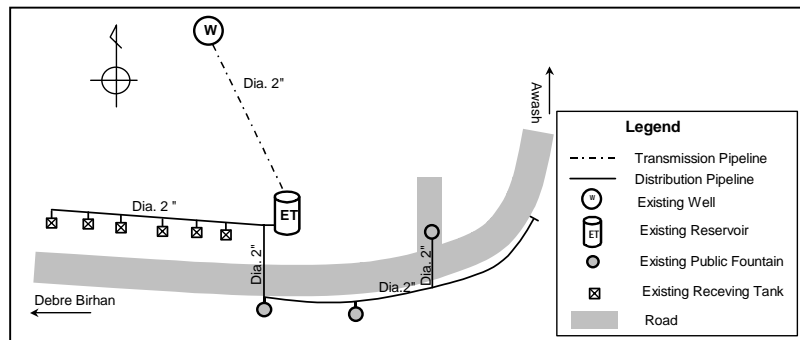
Layout of Existing Facilities of Dulecha
